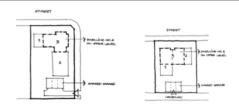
Multi Dwelling Housing - Big House Concept delete
